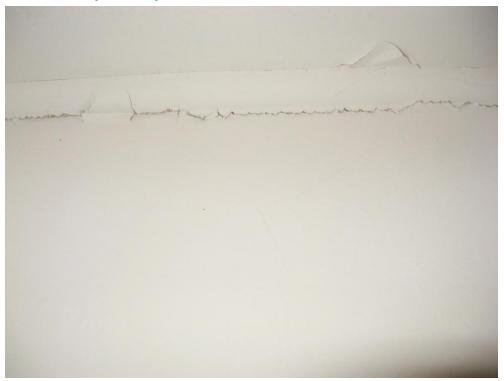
Typical damage at plasterboard ceiling connection to masonry walls.
